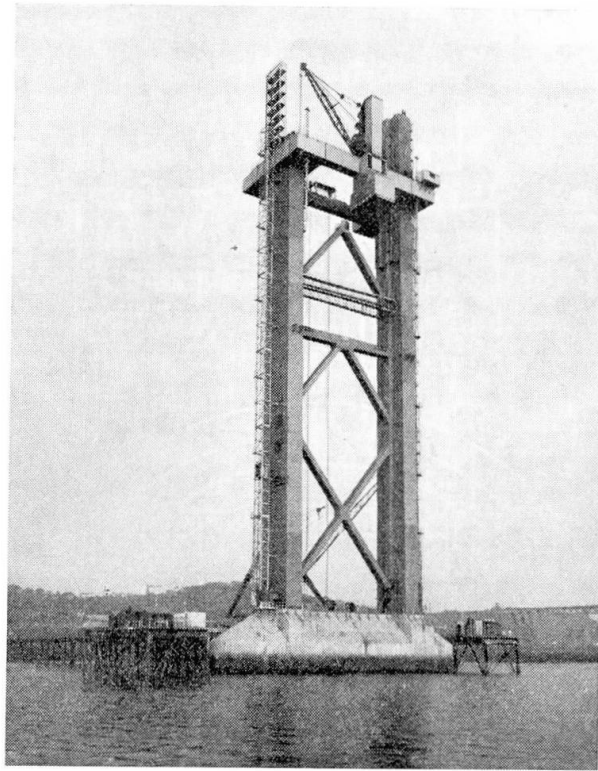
North Tower under construction. Note climbing structure and temporary lift shafts.
